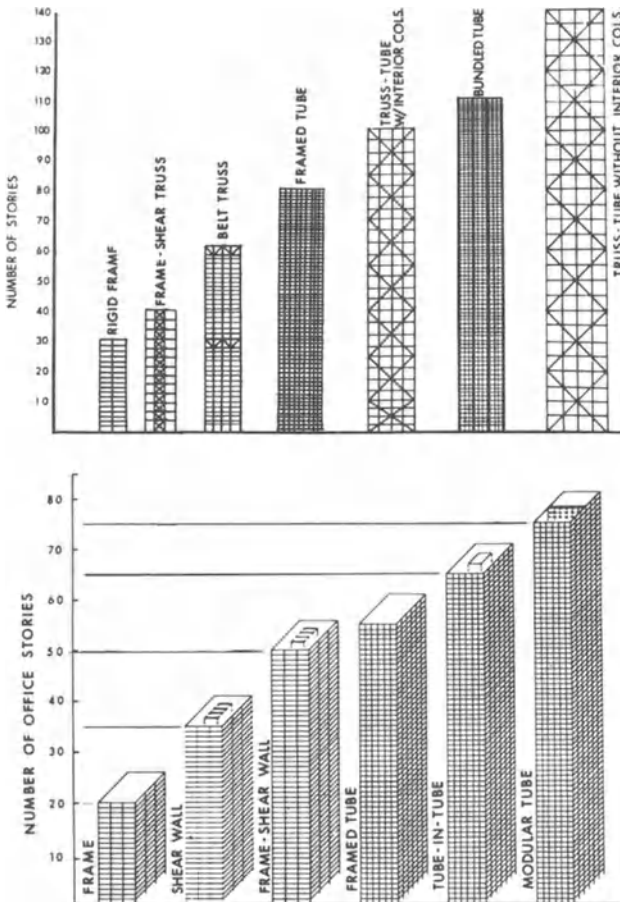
Types of steel and concrete structures (Monograph Vol. SC, p. 5)
